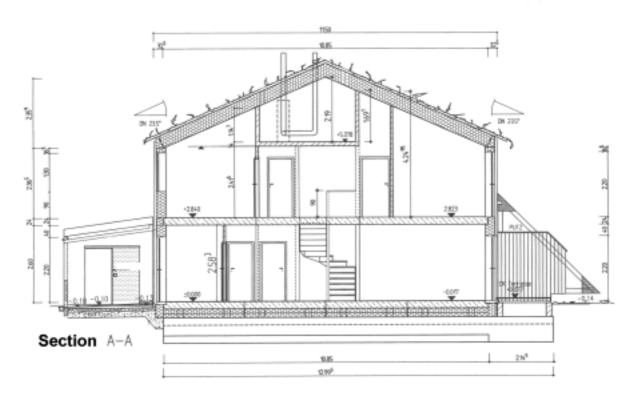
Longitudinal section through a Kronsberg terraced Passive House
